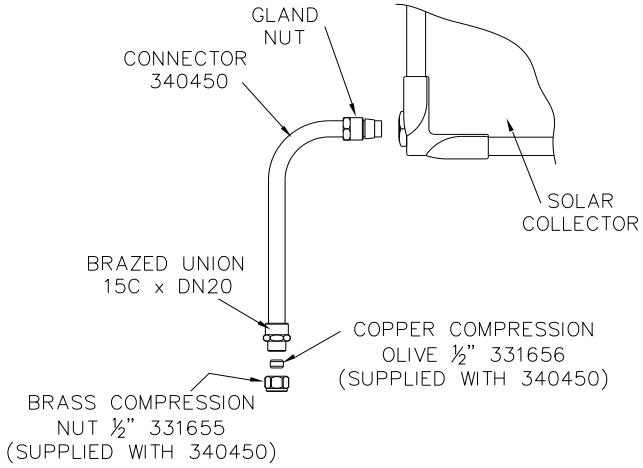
DETAIL A – COLLECTOR UNION ASSEMBLY – CONETITE FITTING
